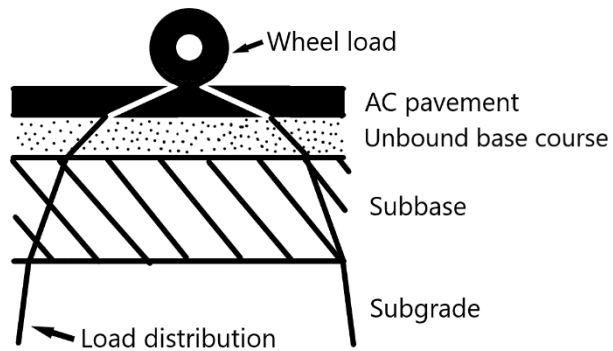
The typical traffic load distribution pattern in a flexible AC pavement.
